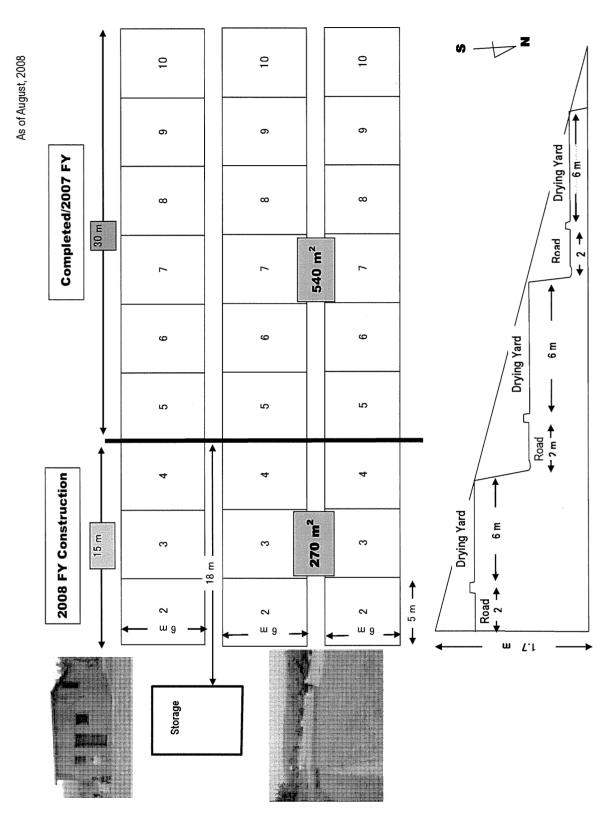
Construction of Concrete Drying Yard for Paddy and Storage
